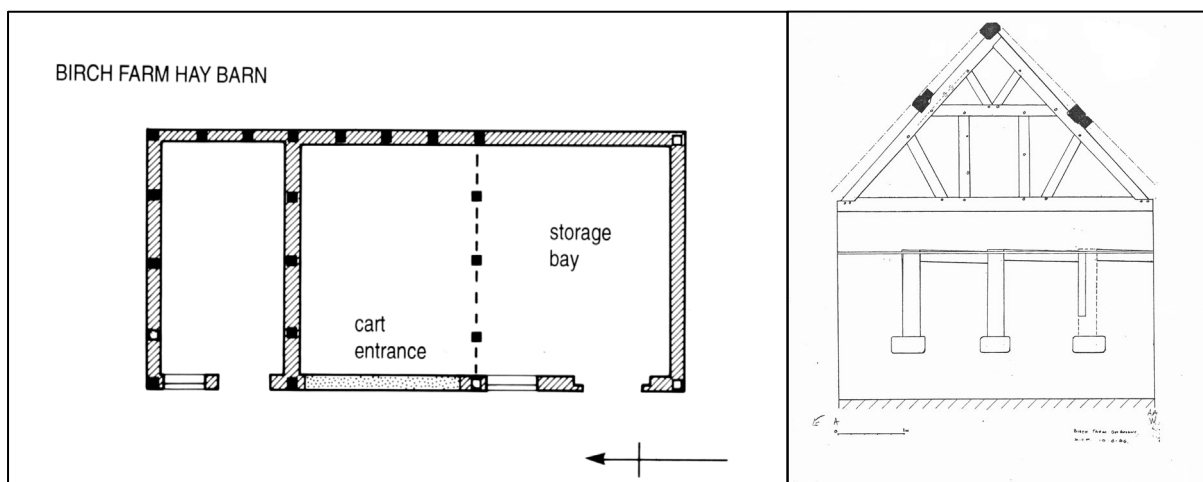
Plan and section of the timber-framed Birch Farm hay barn.
